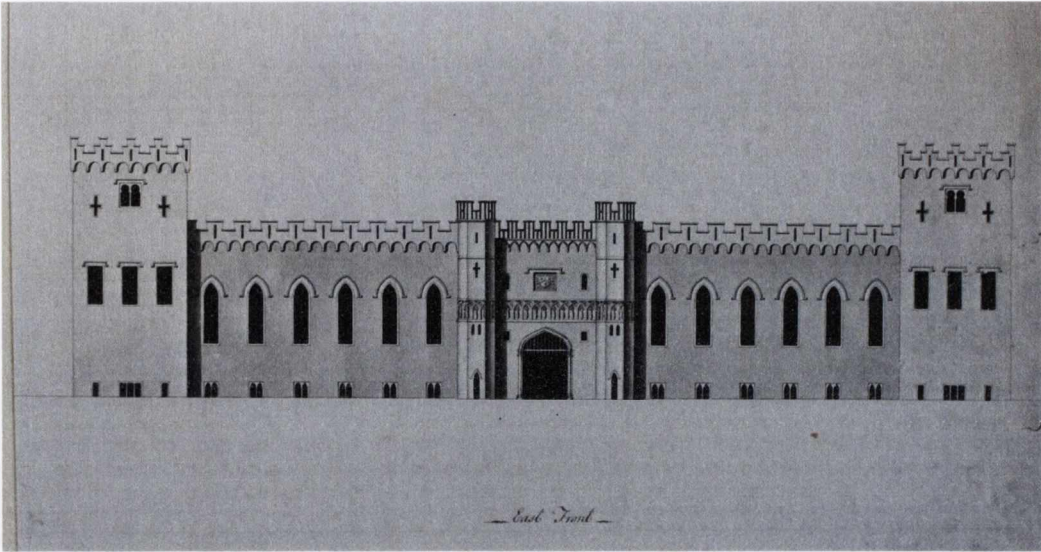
Proposed scheme for Charleville Castle, east elevation, John Pentland 1797, photograph IAA, A/6/13, courtesy of the Irish Architectural Archive.
